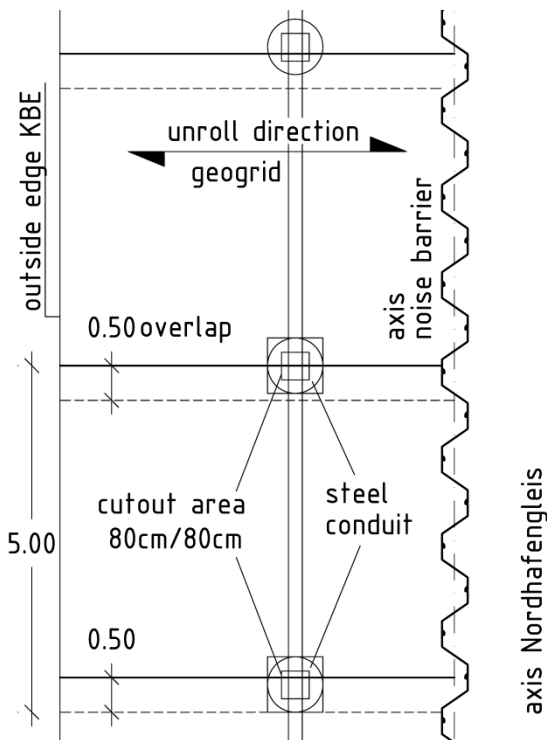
Nordhafengleis Hanover-Ledeburg, site plan
